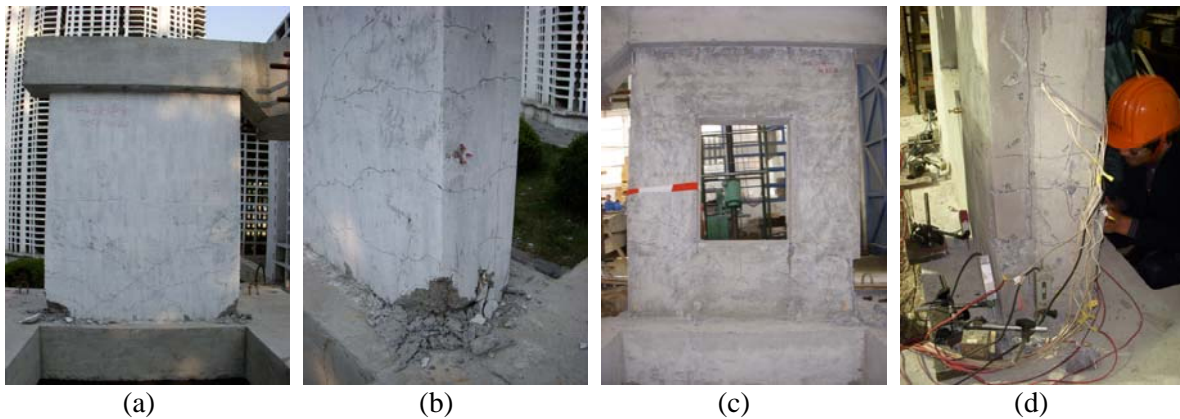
failure picture - (a) front view of PCFA; (b) side view of PCFA; (c) front view of PCFB; (d) side view of PCFB
